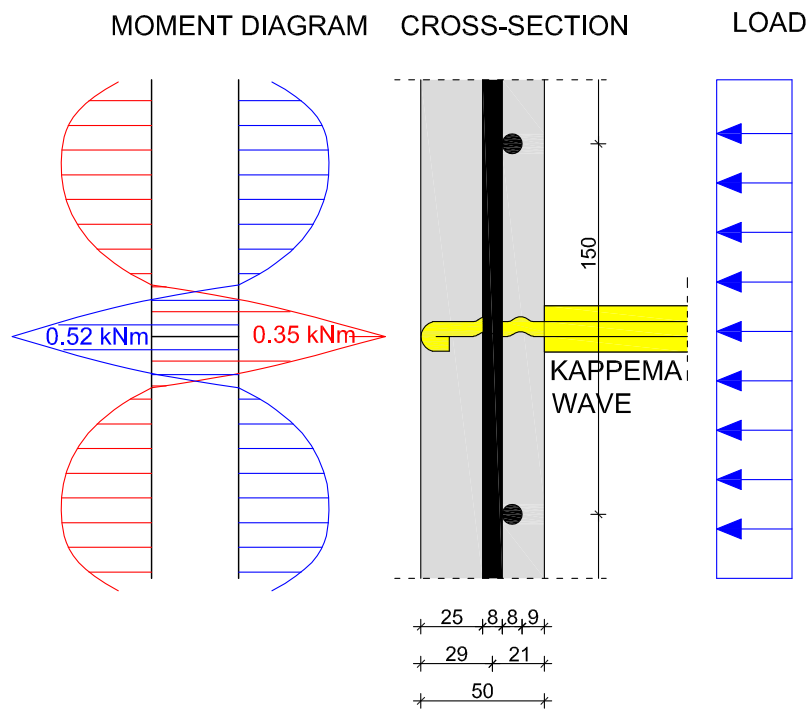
Closer view on the horizontal strip loading with chosen reinforcement position [mm]
